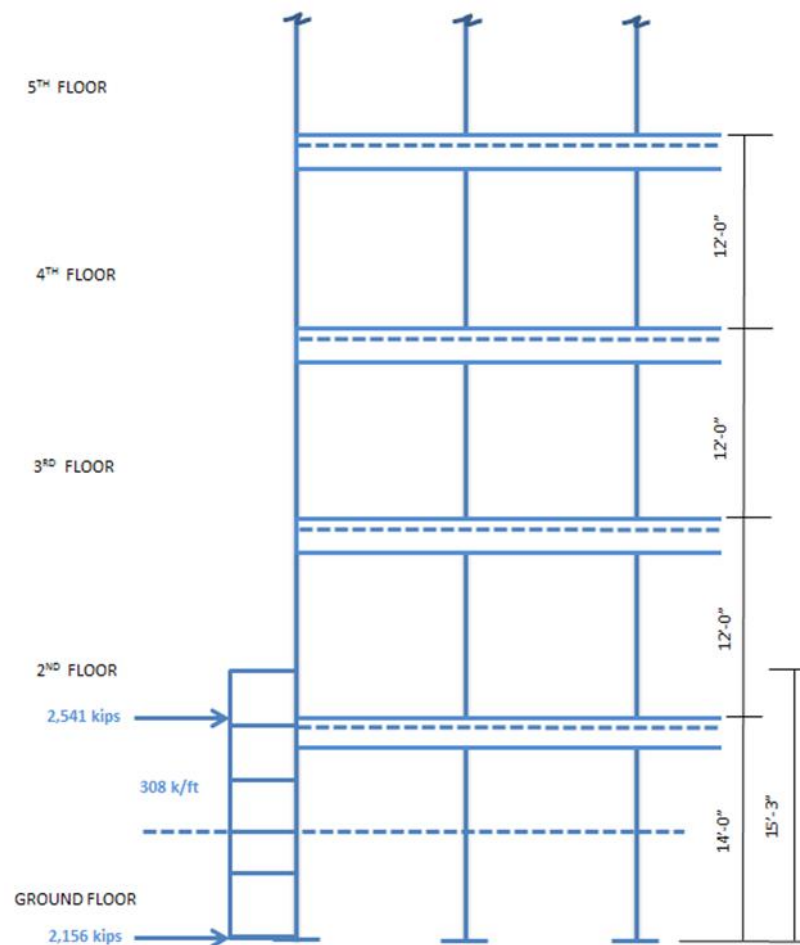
LC2 Tsunami loads on overall Waikiki office building
